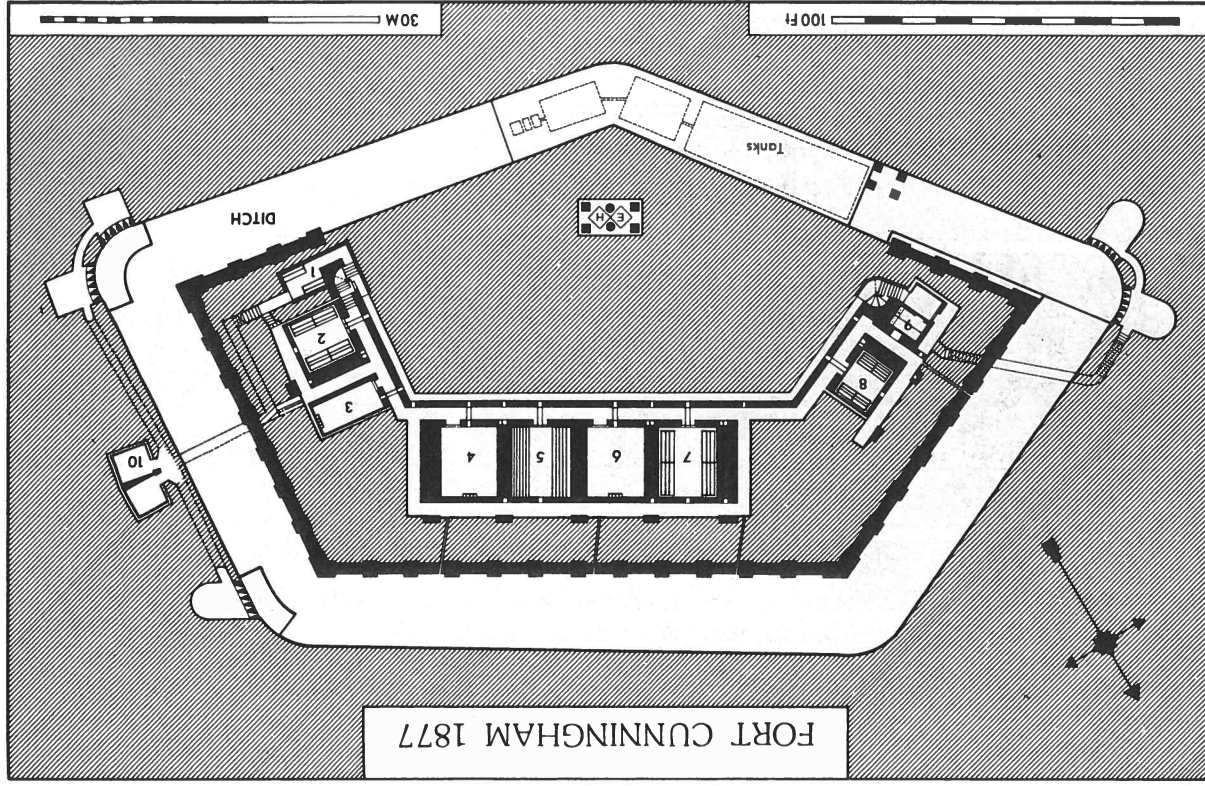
The secondary ditches for the counterscarp galleries were discovered in 1991 and have been added to this rendition of a record plan of 1877 (PRO WO 78/5406). The plan also shows the thirty-two arches of the 1820s masonry escarp.
